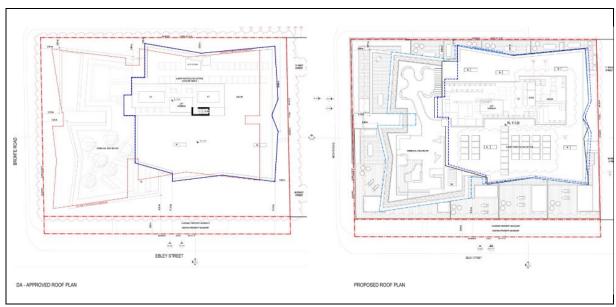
Comparison roof plan showing modification to approved plant area (previous approval scheme on left, proposed scheme on right)
